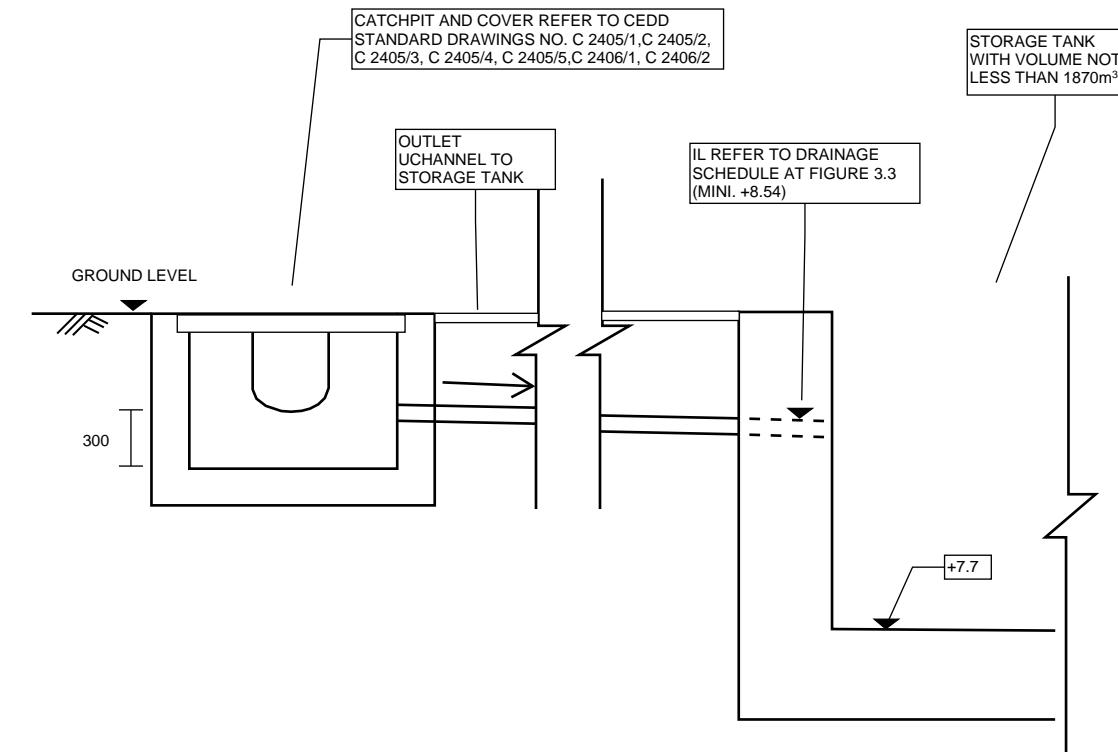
DETAIL OF OVERFLOW PIPE FROM STORAGE TANK
